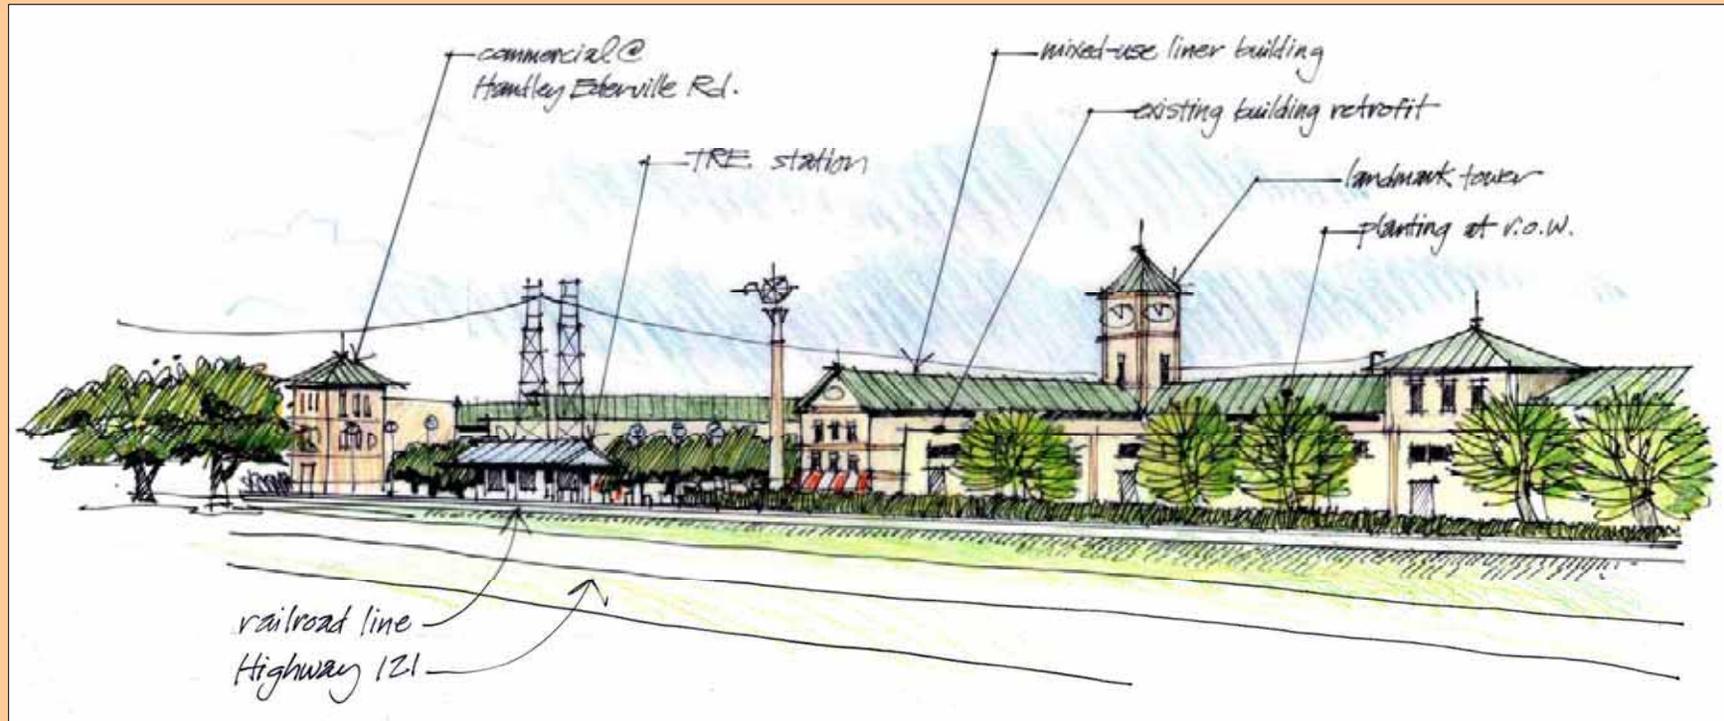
TRE Station and new development, view from SH-121 looking south and east
